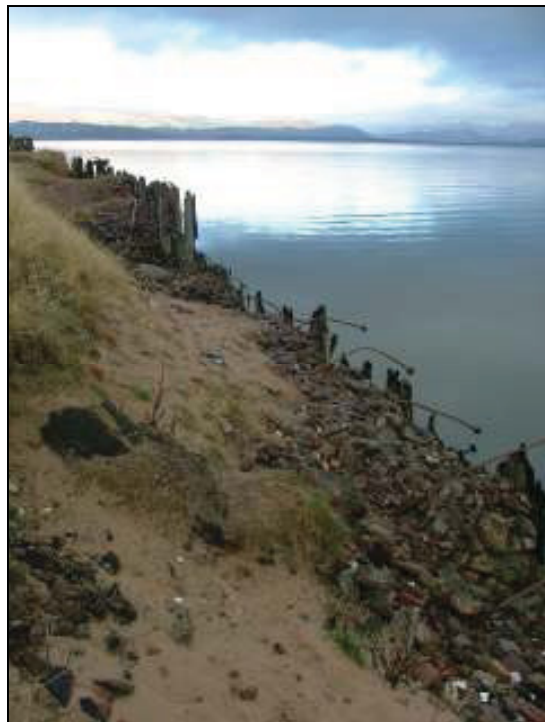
View looking north-west showing surviving timberwork and iron fittings relating to Hodbarrow Pier
